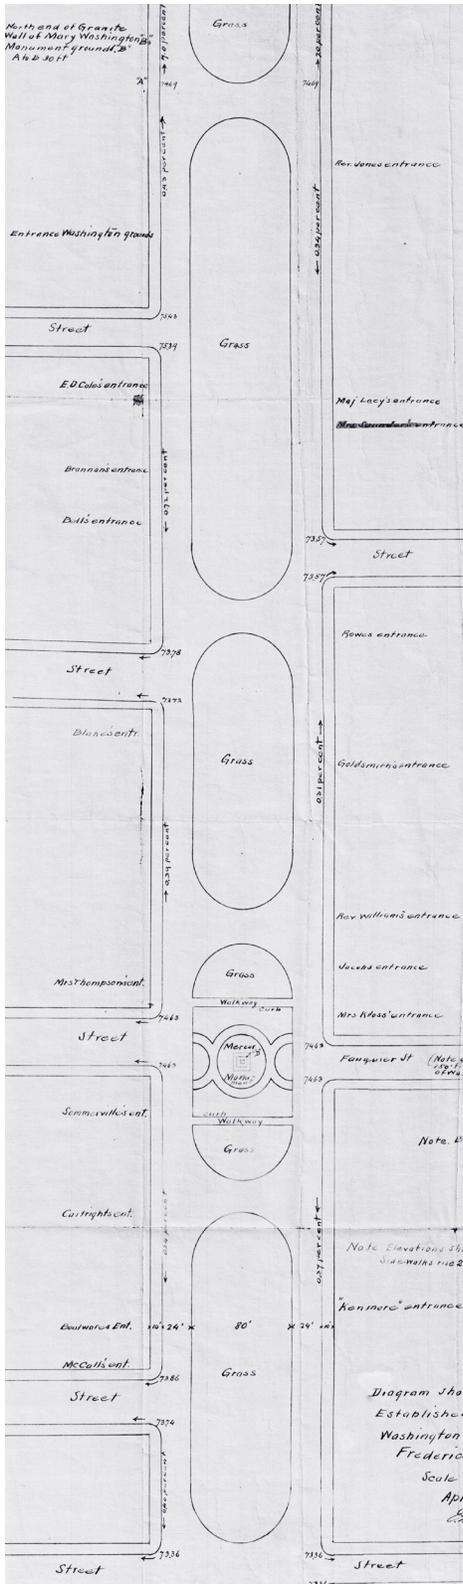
1908 layout of the Washington Avenue Mall blocks, drafted by engineer, E. D. Meyers, Jr.
